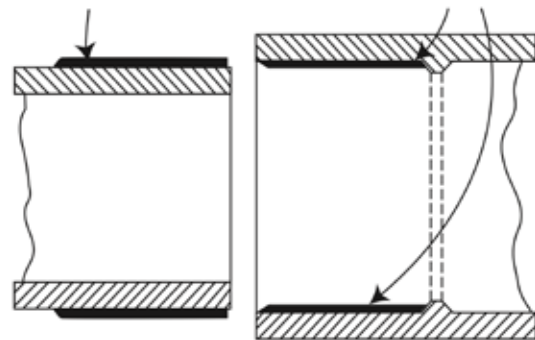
Solvent cement coatings of sufficient thickness applied uniformly around pipe and inside fitting socket.
